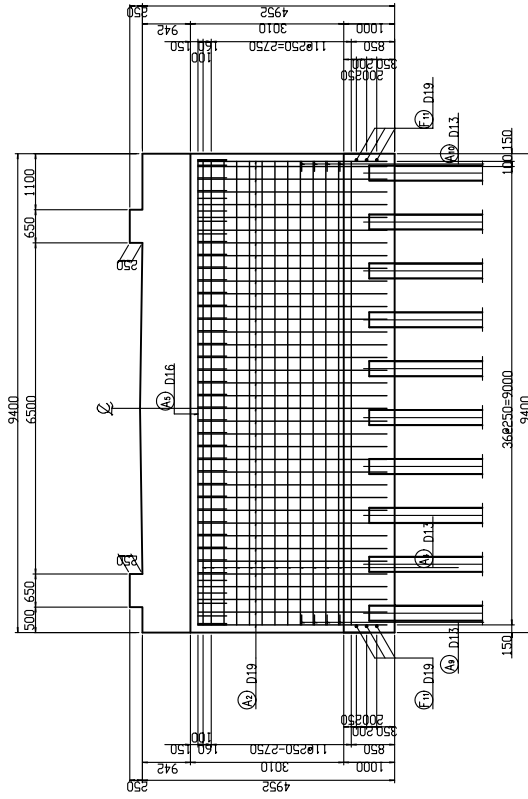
DETAILS OF SUPPORT ANCHOR SCALE 1:20
